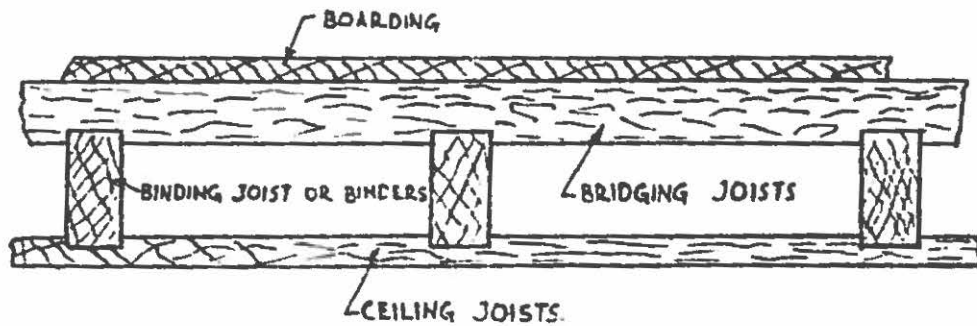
DOUBLE FLOOR WITH CEILING JOISTS
